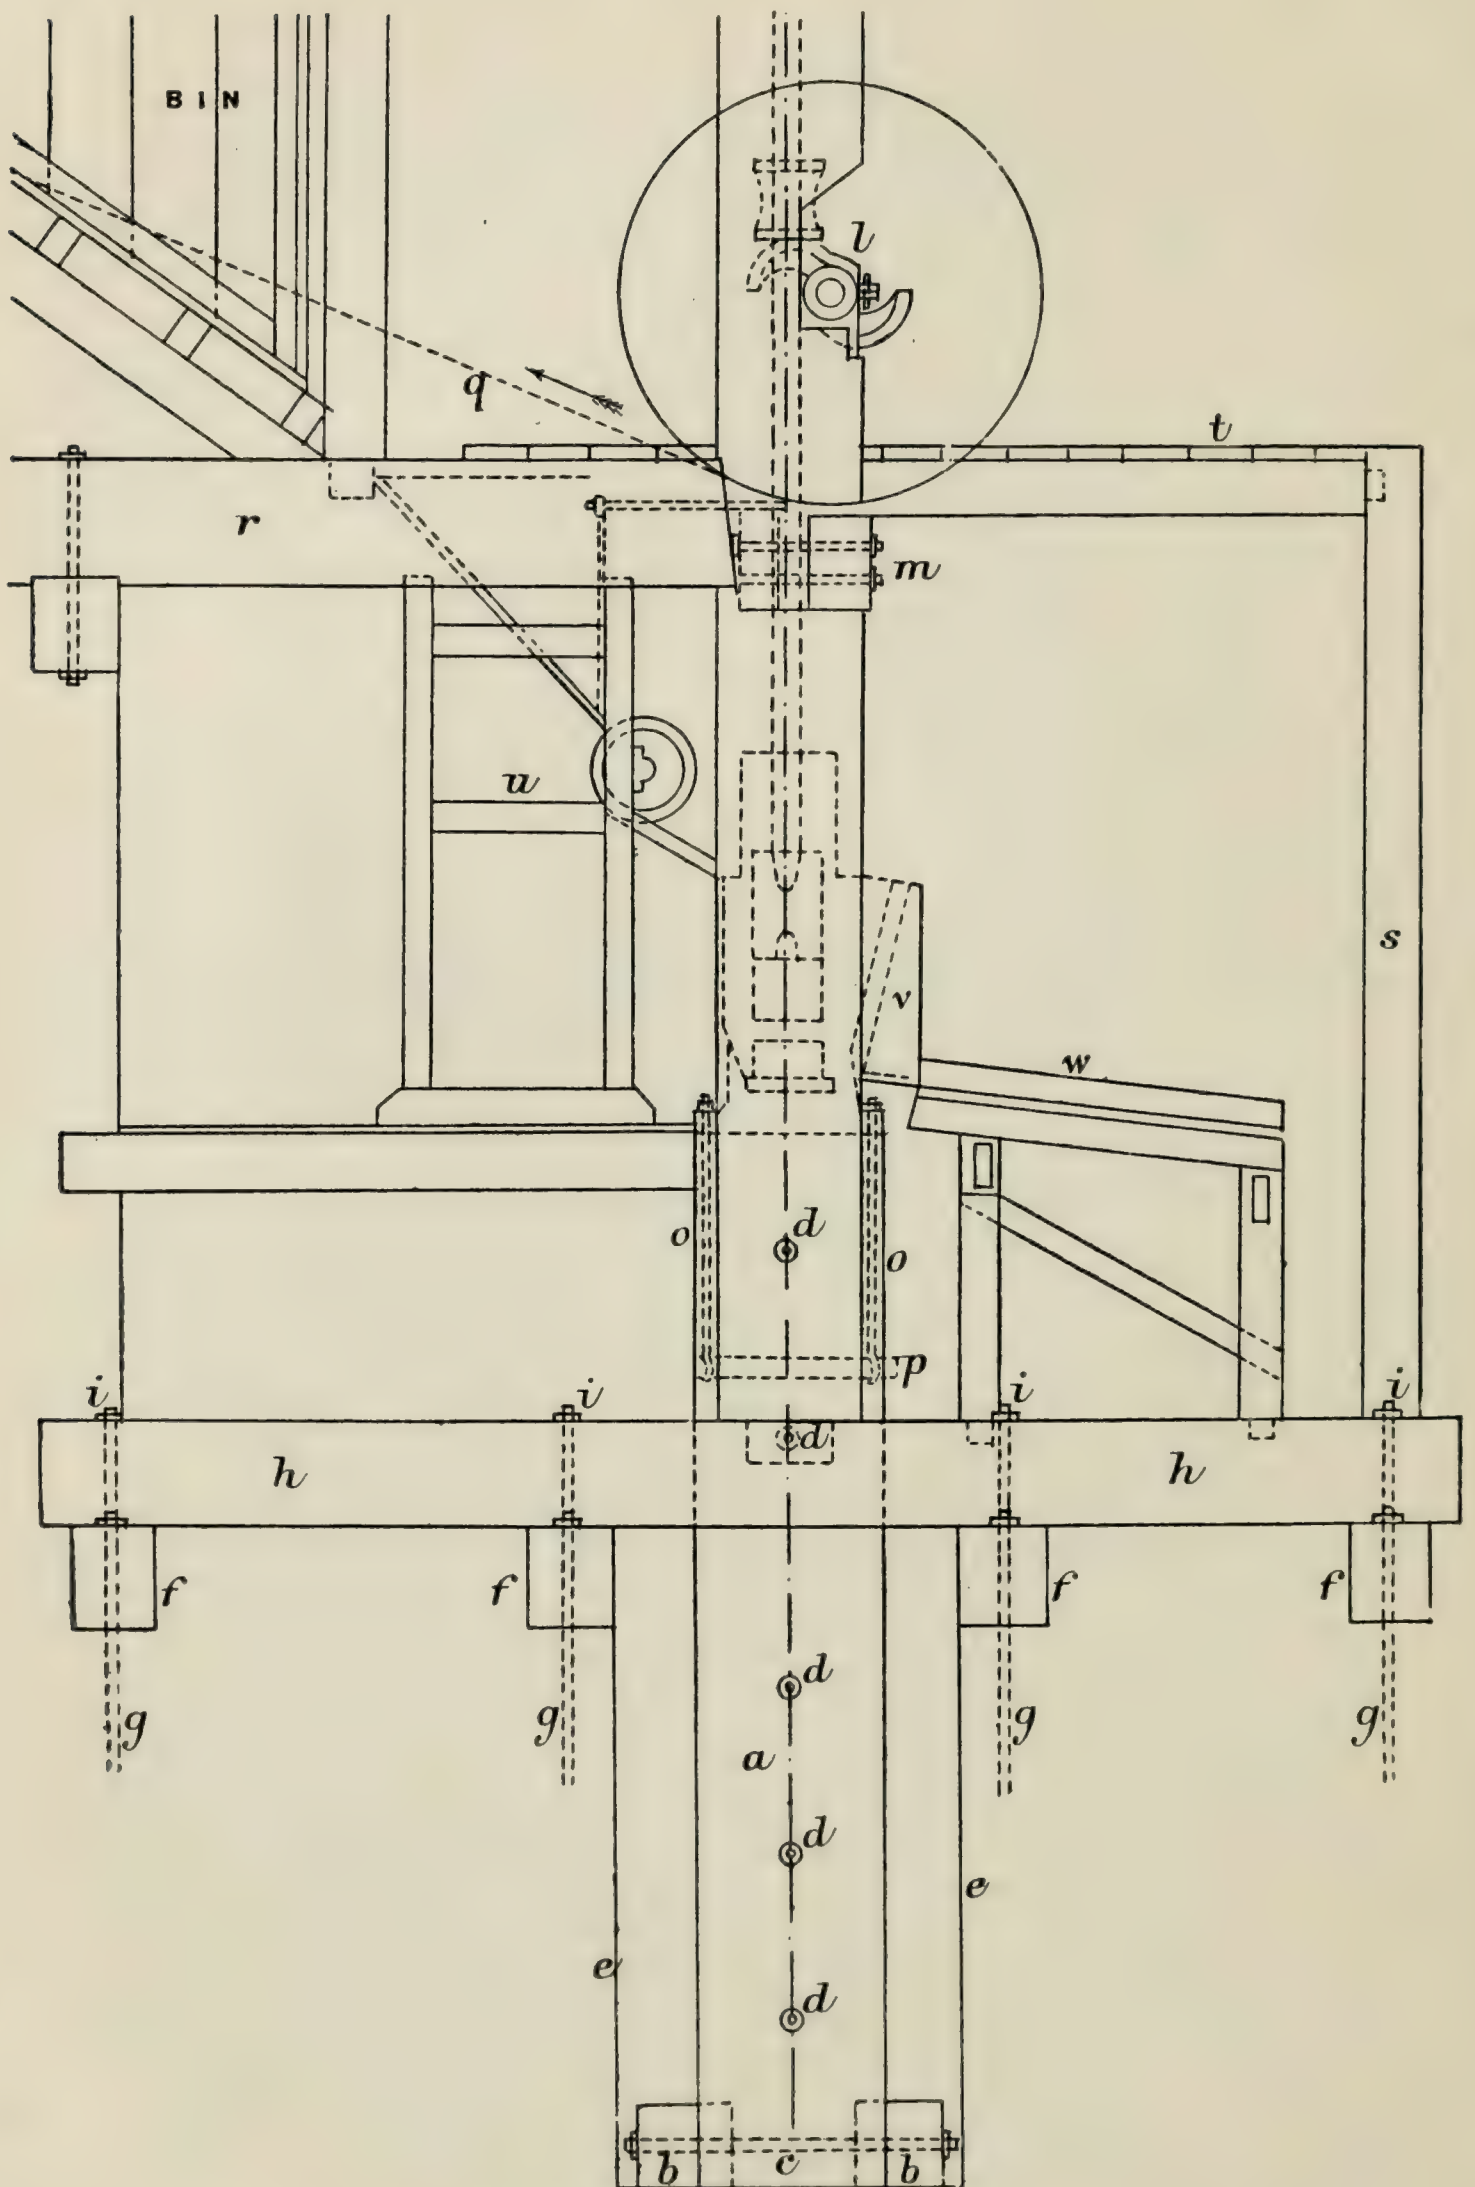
BATTERY FOUNDATION AND FRAMING.
